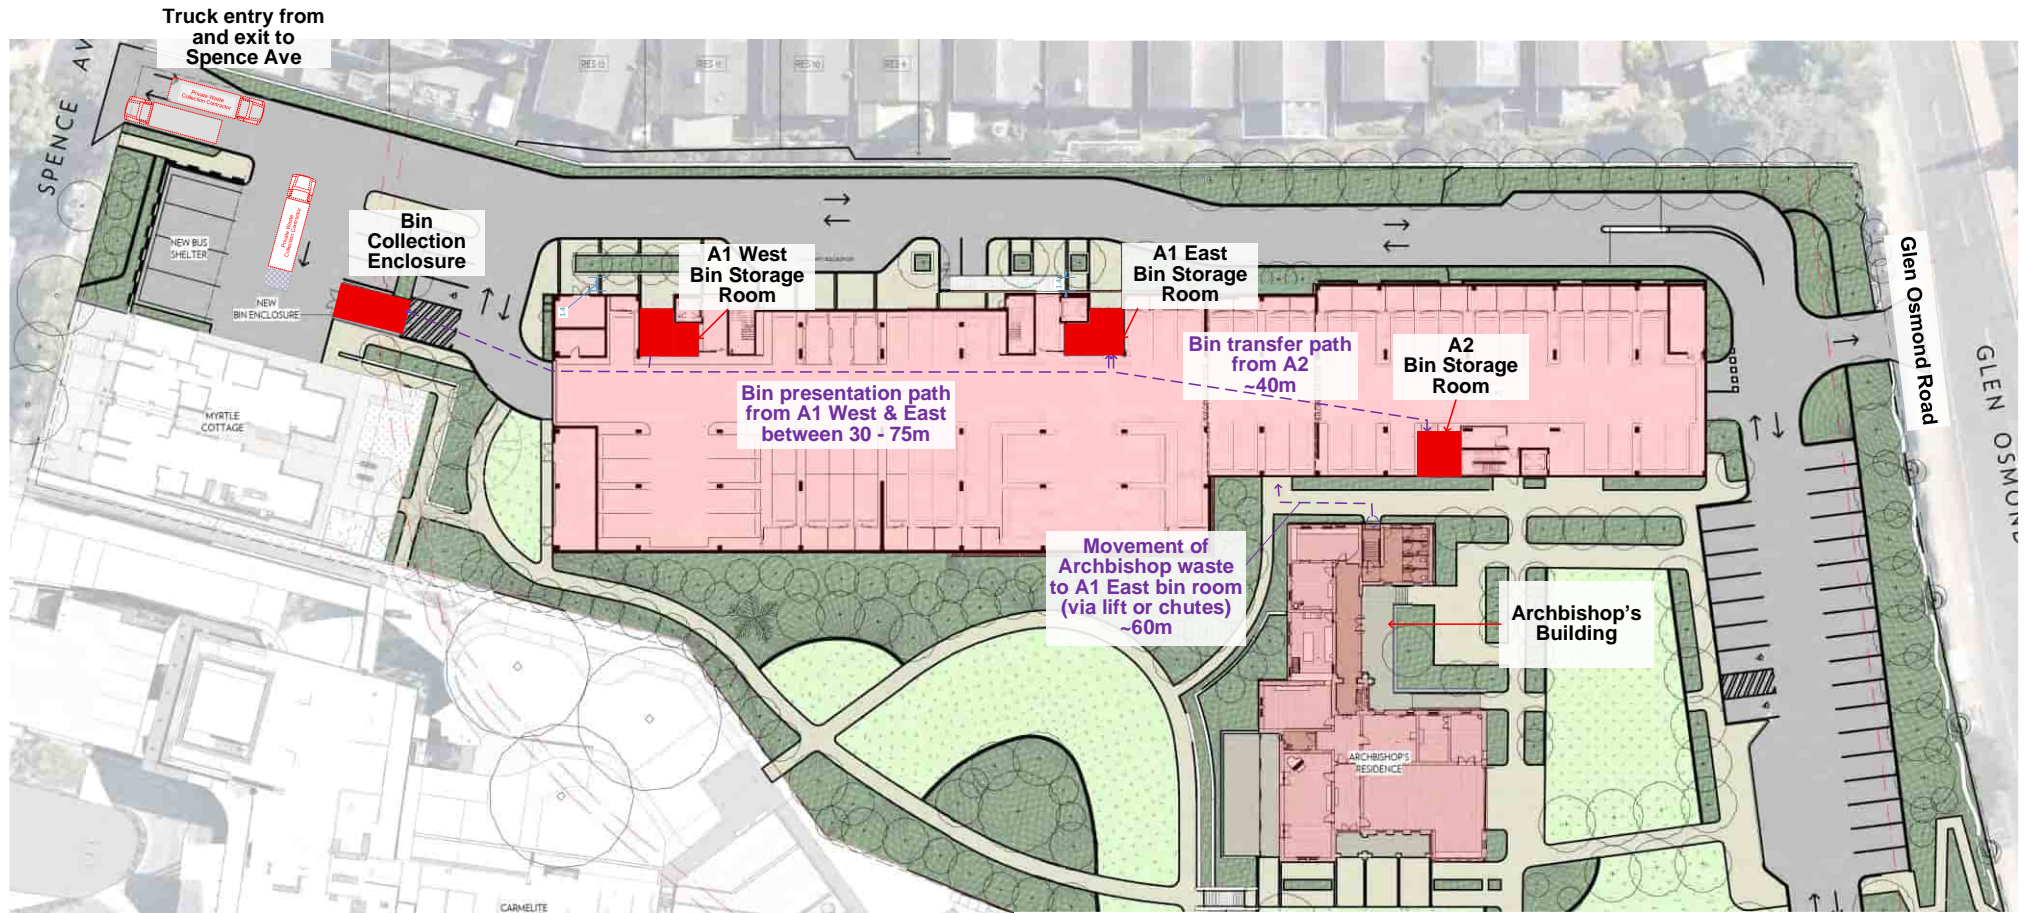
Overview of site including waste storage areas and transfer pathways
